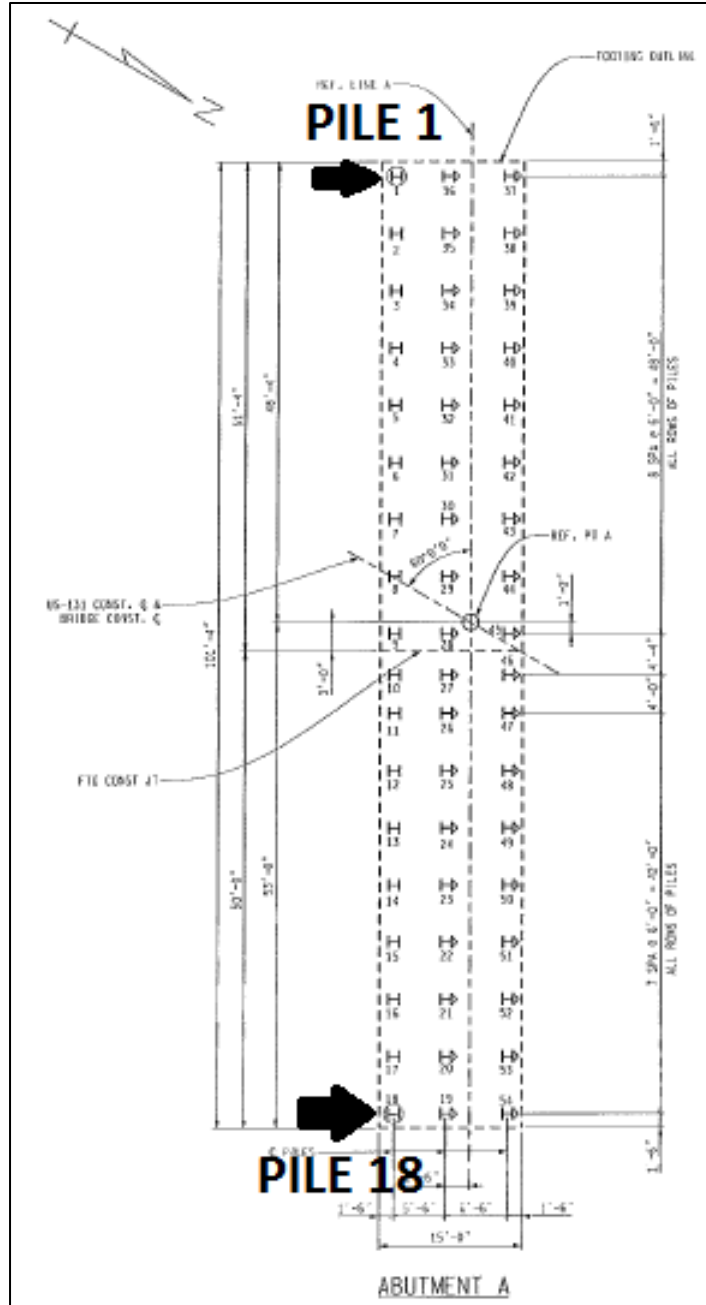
Locations of primary test pile #1 and secondary test pile #18 at US 131A site
